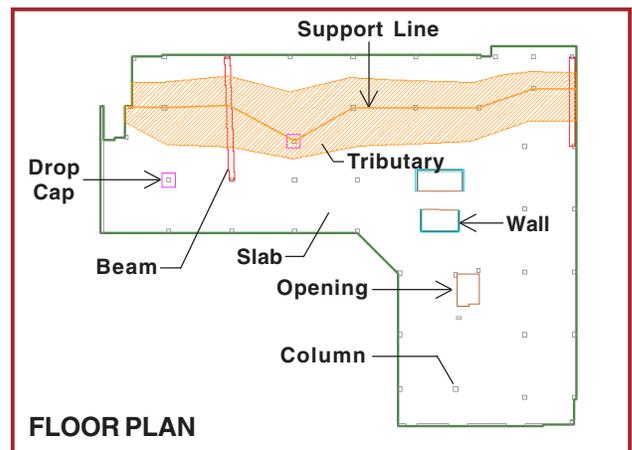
Floor plan of a building defining a support line along a row of columns and its associated tributary areas
